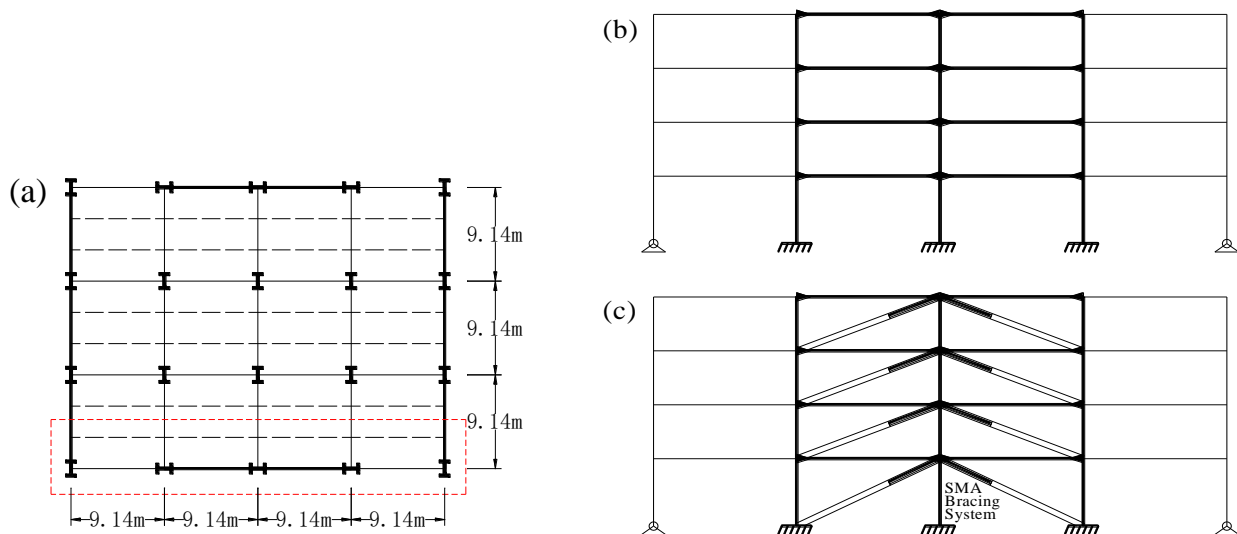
Structural model illustration: (a) Plan view; East-West elevation of (b) SMRF and (c) SMA frame.
